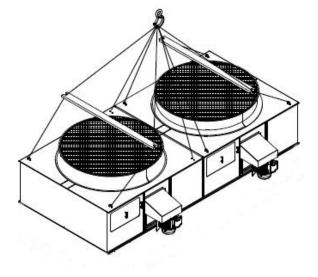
8.5'(2.5m) wide Two-Fan Unit Fan Section
